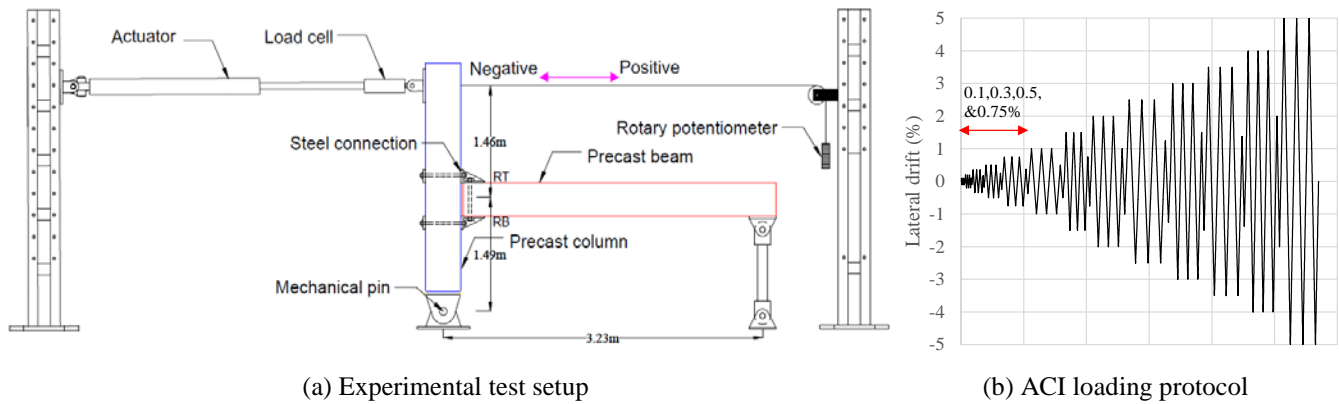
Experimental test setup to assess beam-column sub-assemblies and loading protocol
